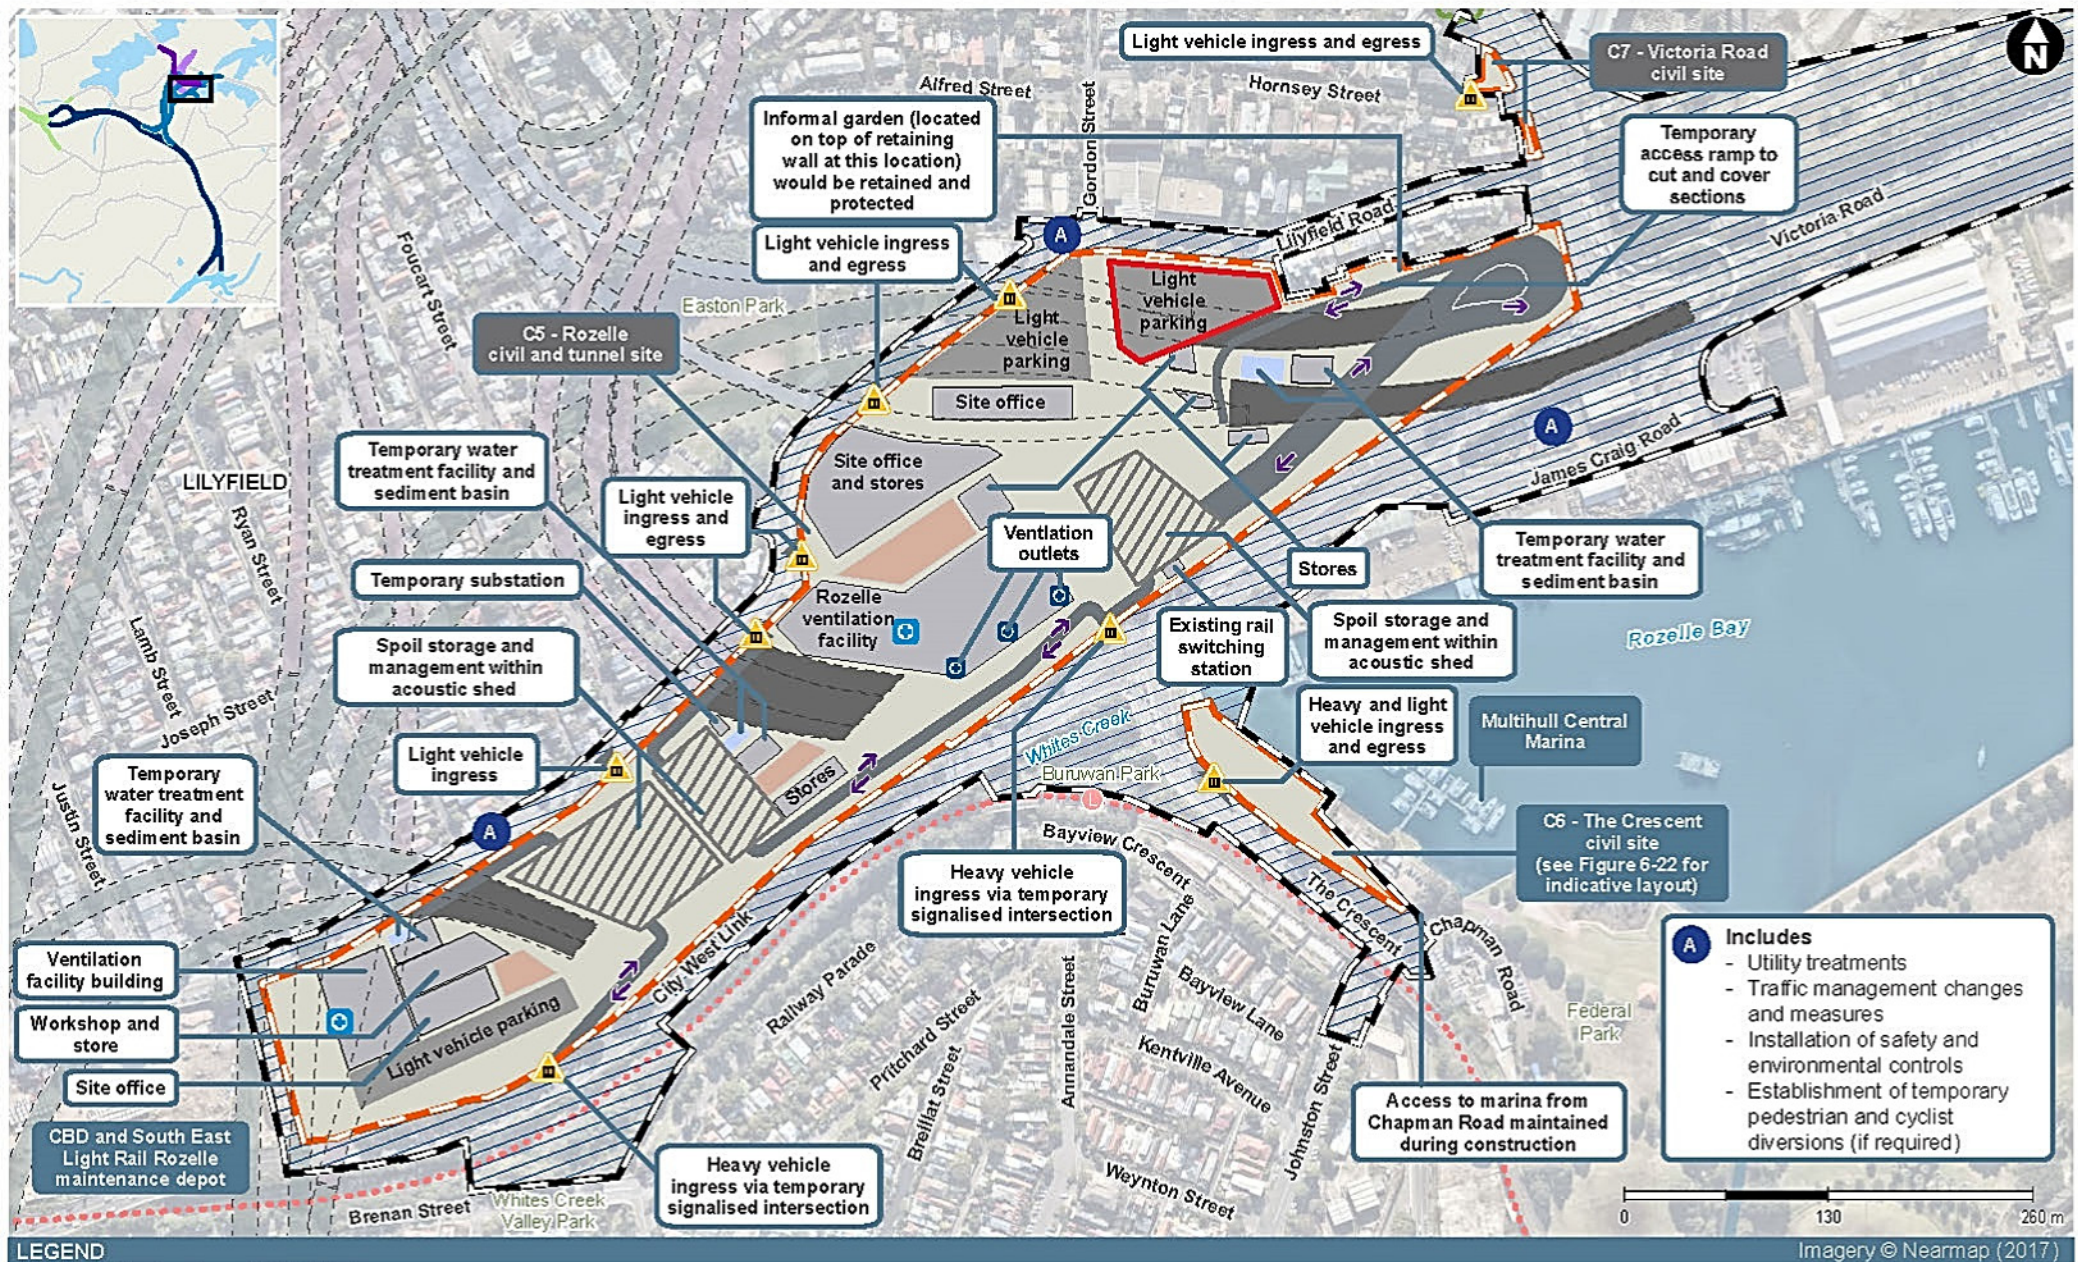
Indicative Rozelle civil and tunnel site (C5) and Victoria Road civil site (C7) layout
